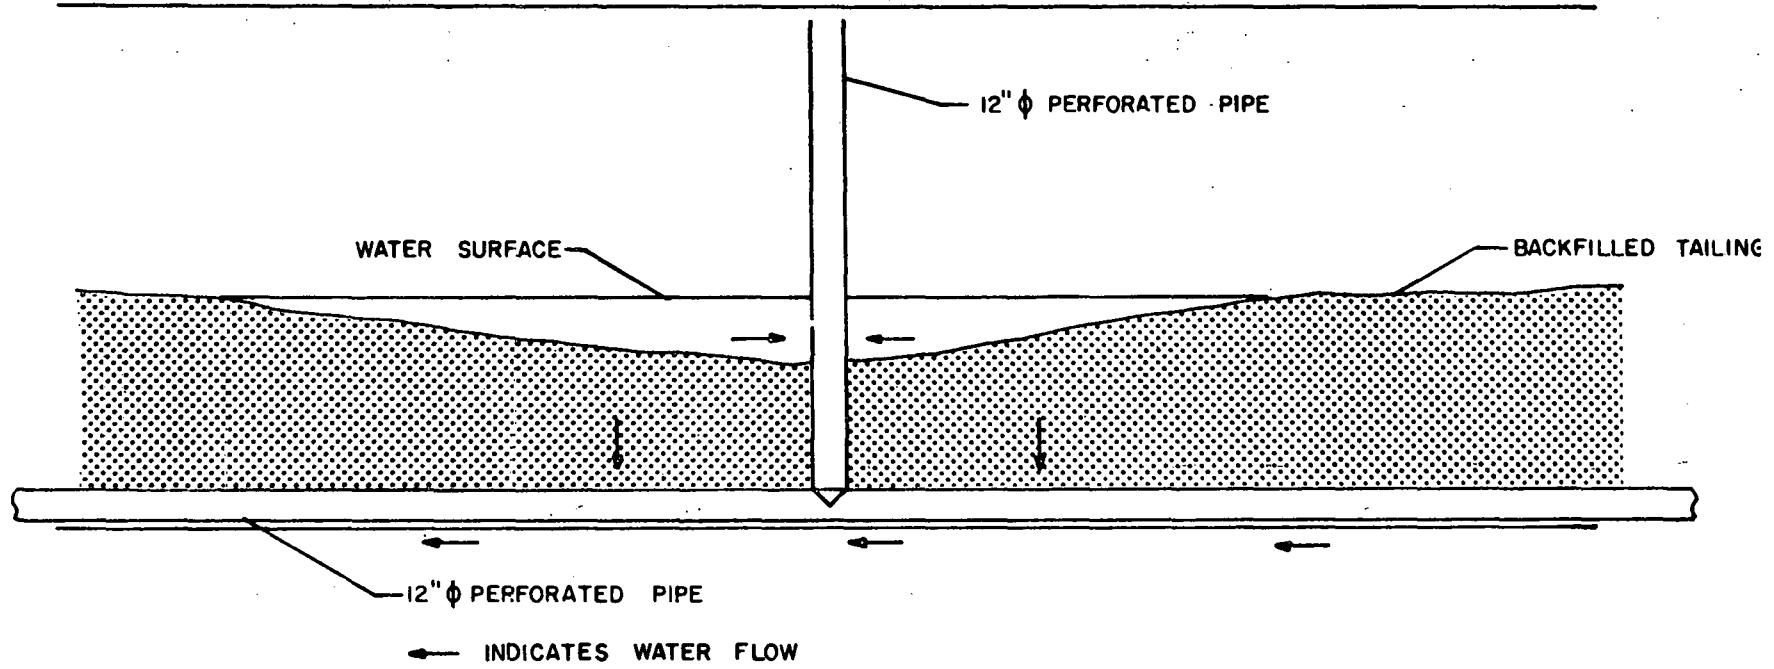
VERTICAL MOUSETRAP DRAIN DETAIL
